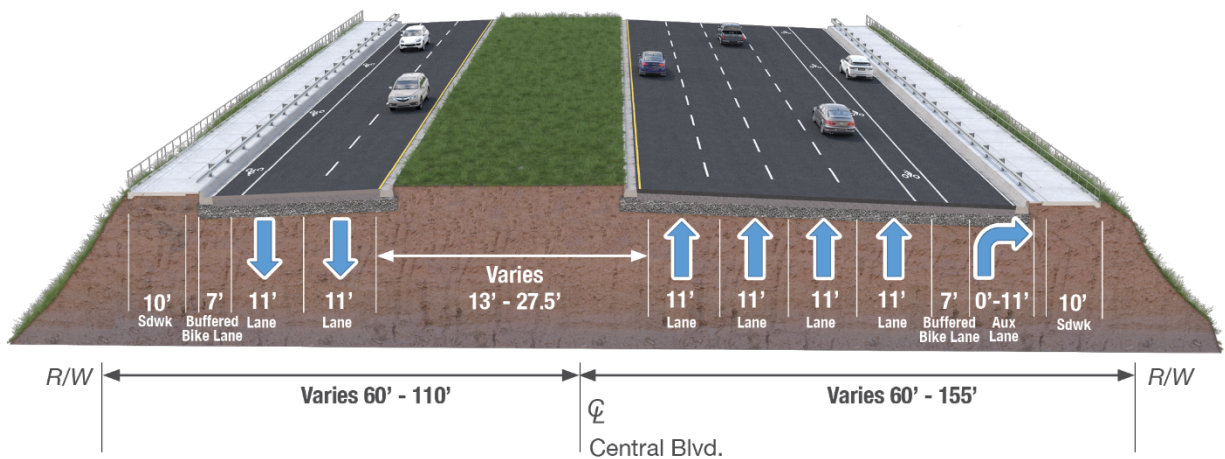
Proposed Typical Section - Central Blvd. West of I-95 – TDUI
